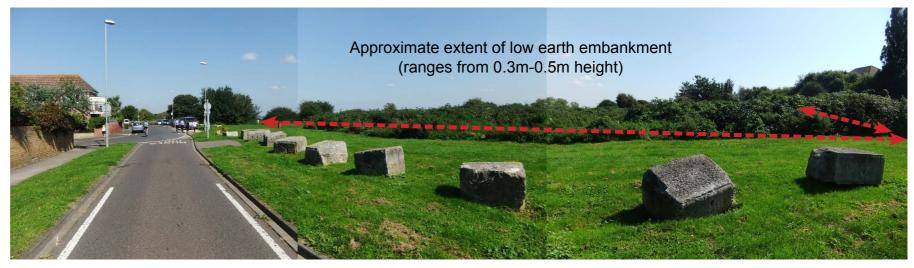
from Moorings Way looking northeast to southeast to the area of the new south earth embankment, including the run along the southern boundary of the Common
